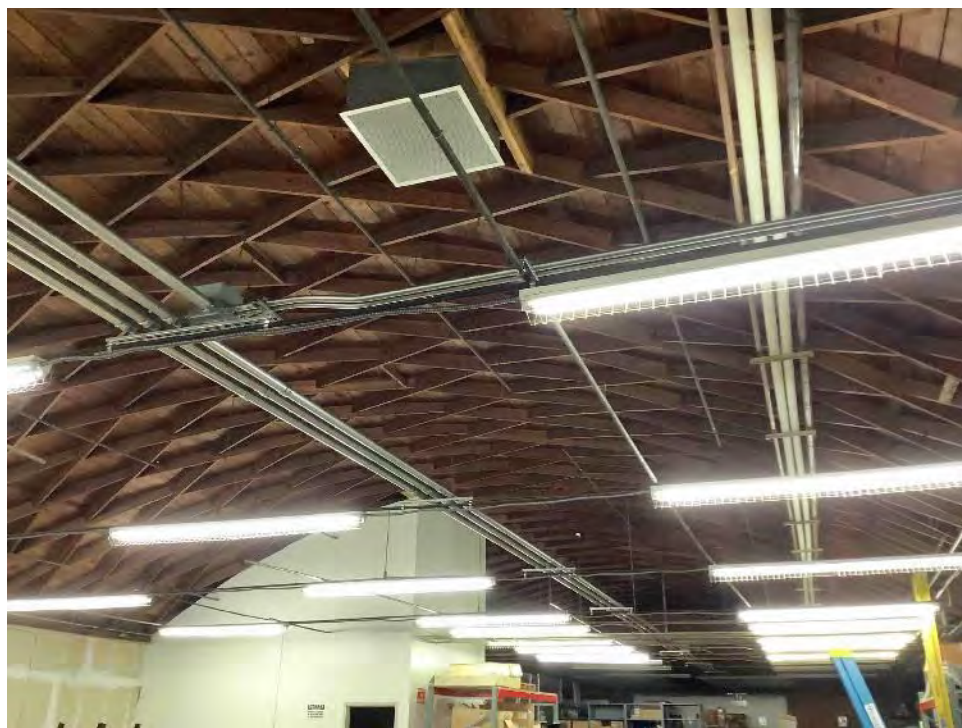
Detail of Lamella Ceiling in Building 4
